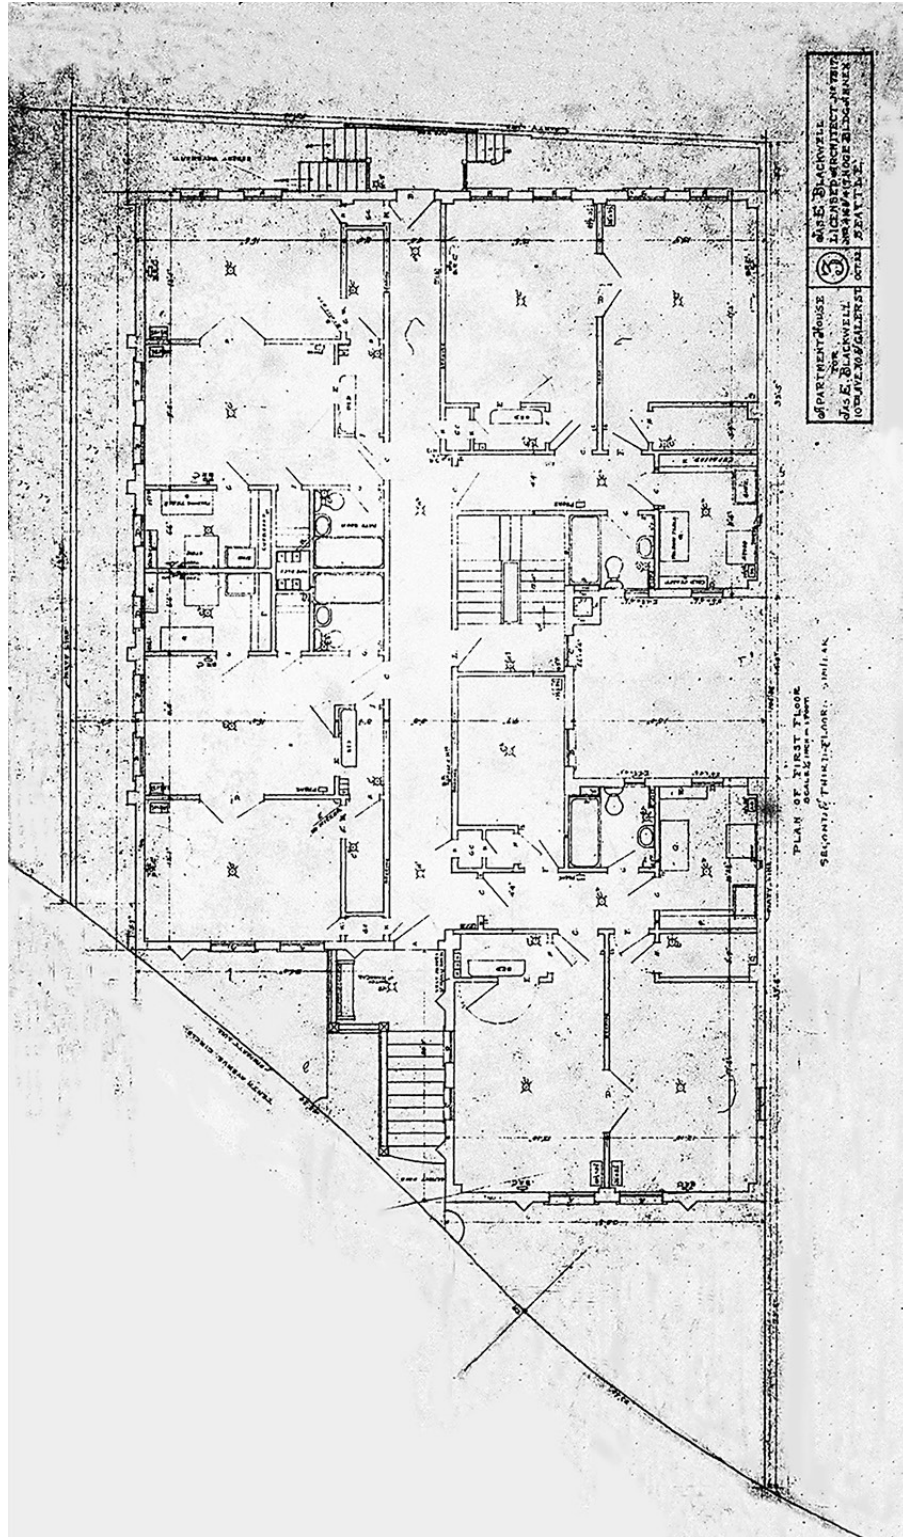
Original 1922 Blackwell blueprint showing first floor plan. The upper floors follow the same plan. (These floors are now considered the second, third and fourth floors.)
